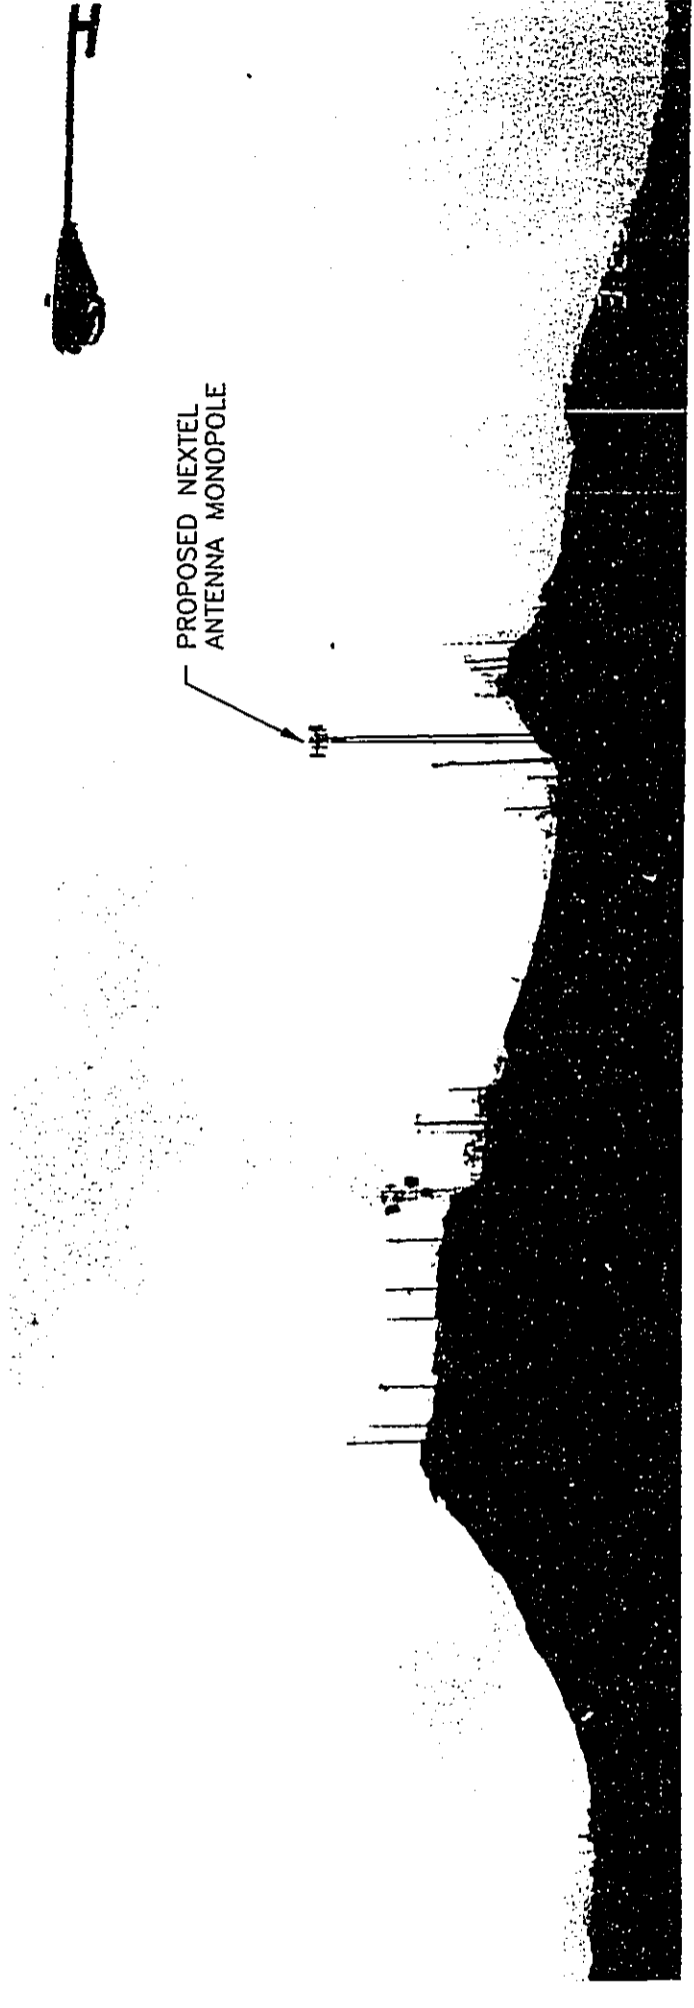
TELEPHOTO SHOT FROM PHOTO 15 VANTAGE POINT (90 mm lens)
